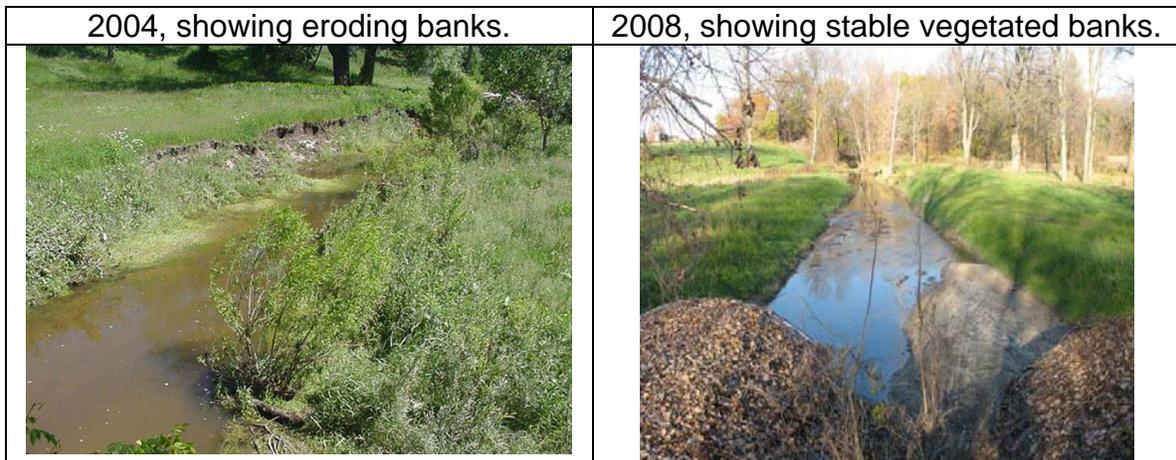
Russcher Road south of 144th Avenue, before and after bank stabilization.
